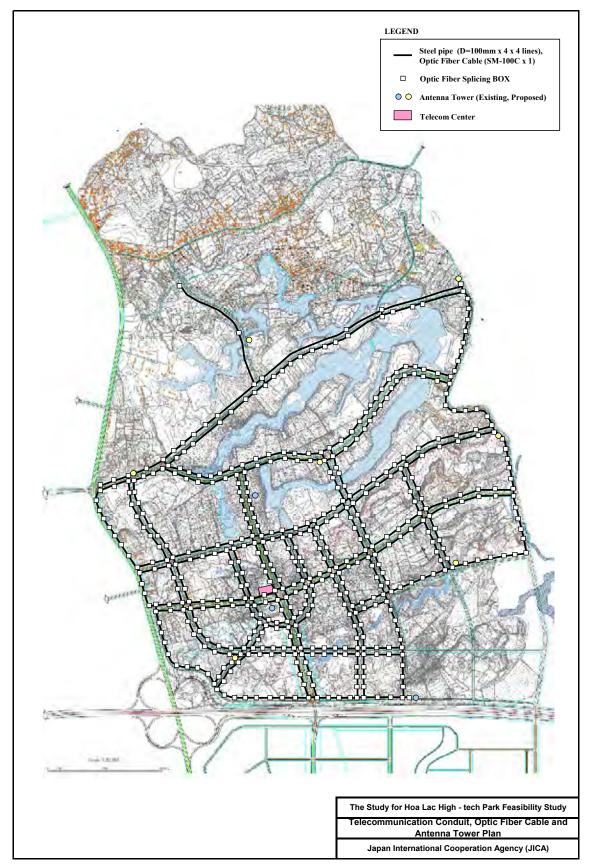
Telecommunication Conduit and Antenna Tower Plan
